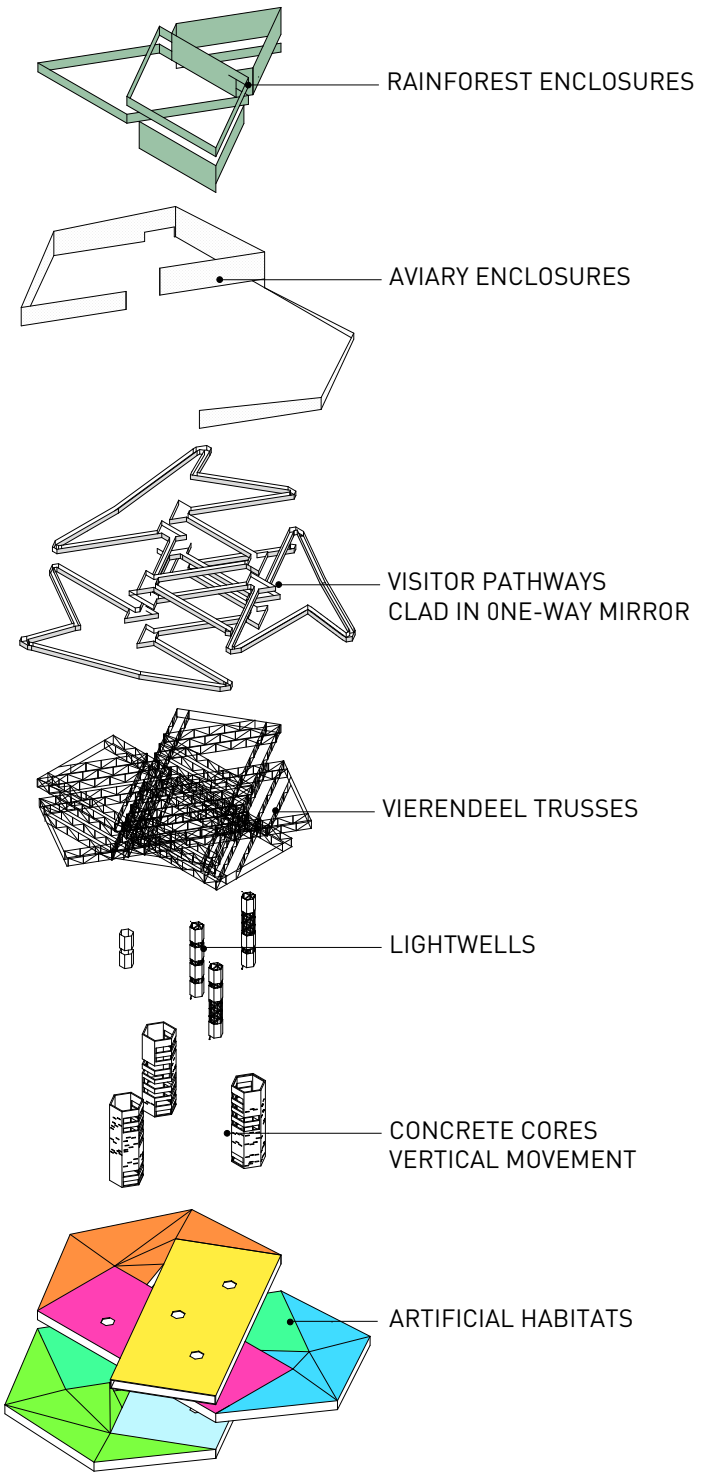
FIG K/EXPLODED AXONOMETRIC - BUILDING ELEMENTS
